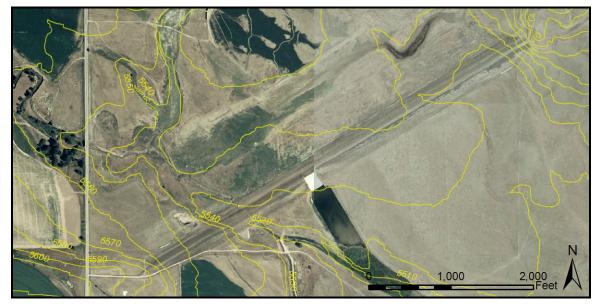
Aerial photograph of Boxelder B-2 embankment. 2005 image, with preconstruction contours.
